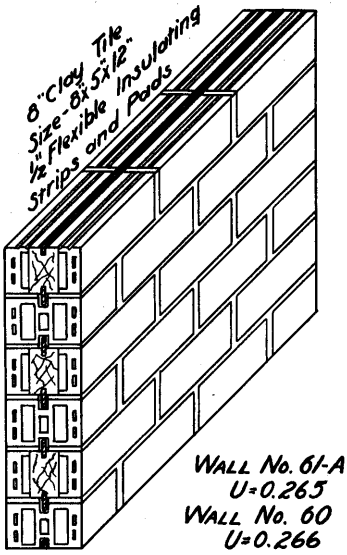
SECTIONAL VIEWS OF TEST WALLS
